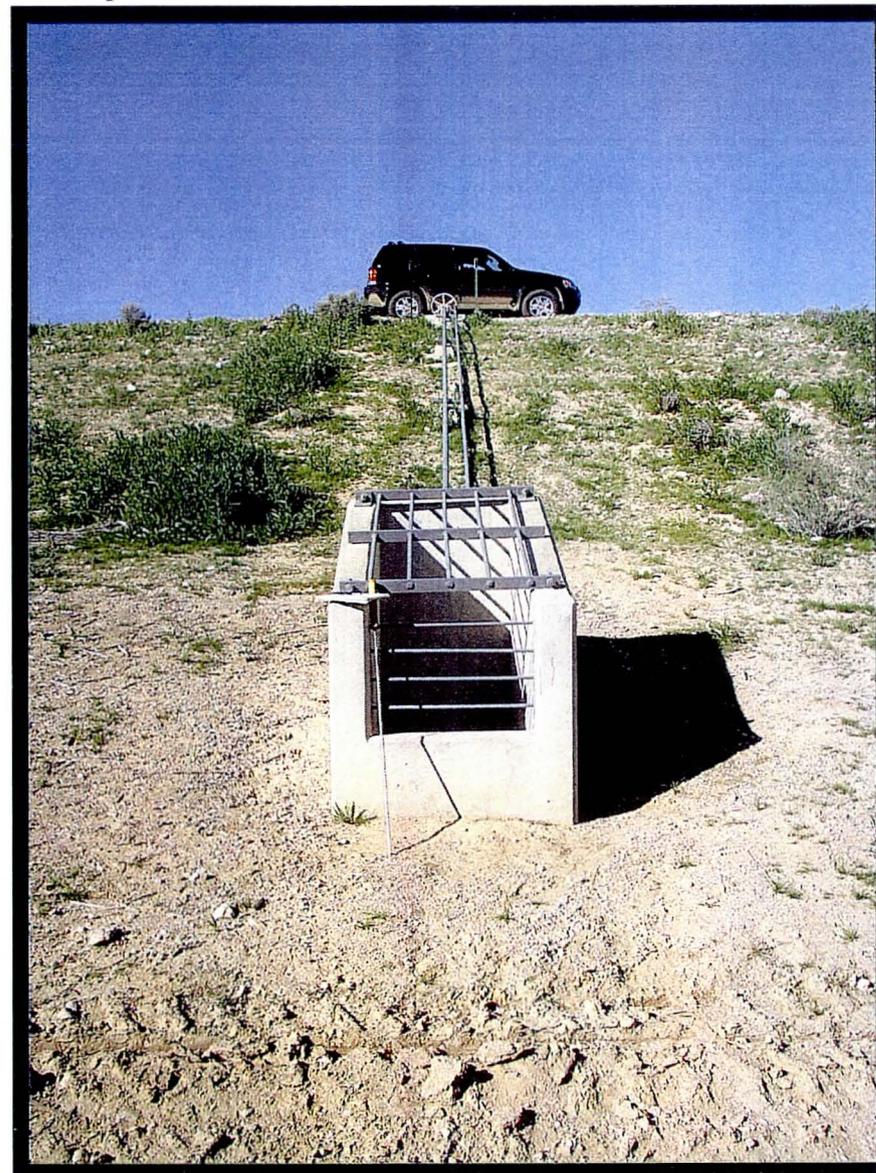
Vegetation Outlet at Station 60+50: Box was clean with the valve closed. Two holes were located on either side of the outlet.
